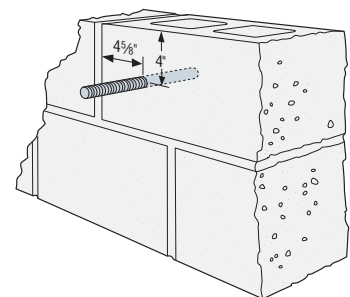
Anchor Installed in Face Shell with Screen Tube in Hollow Cell
